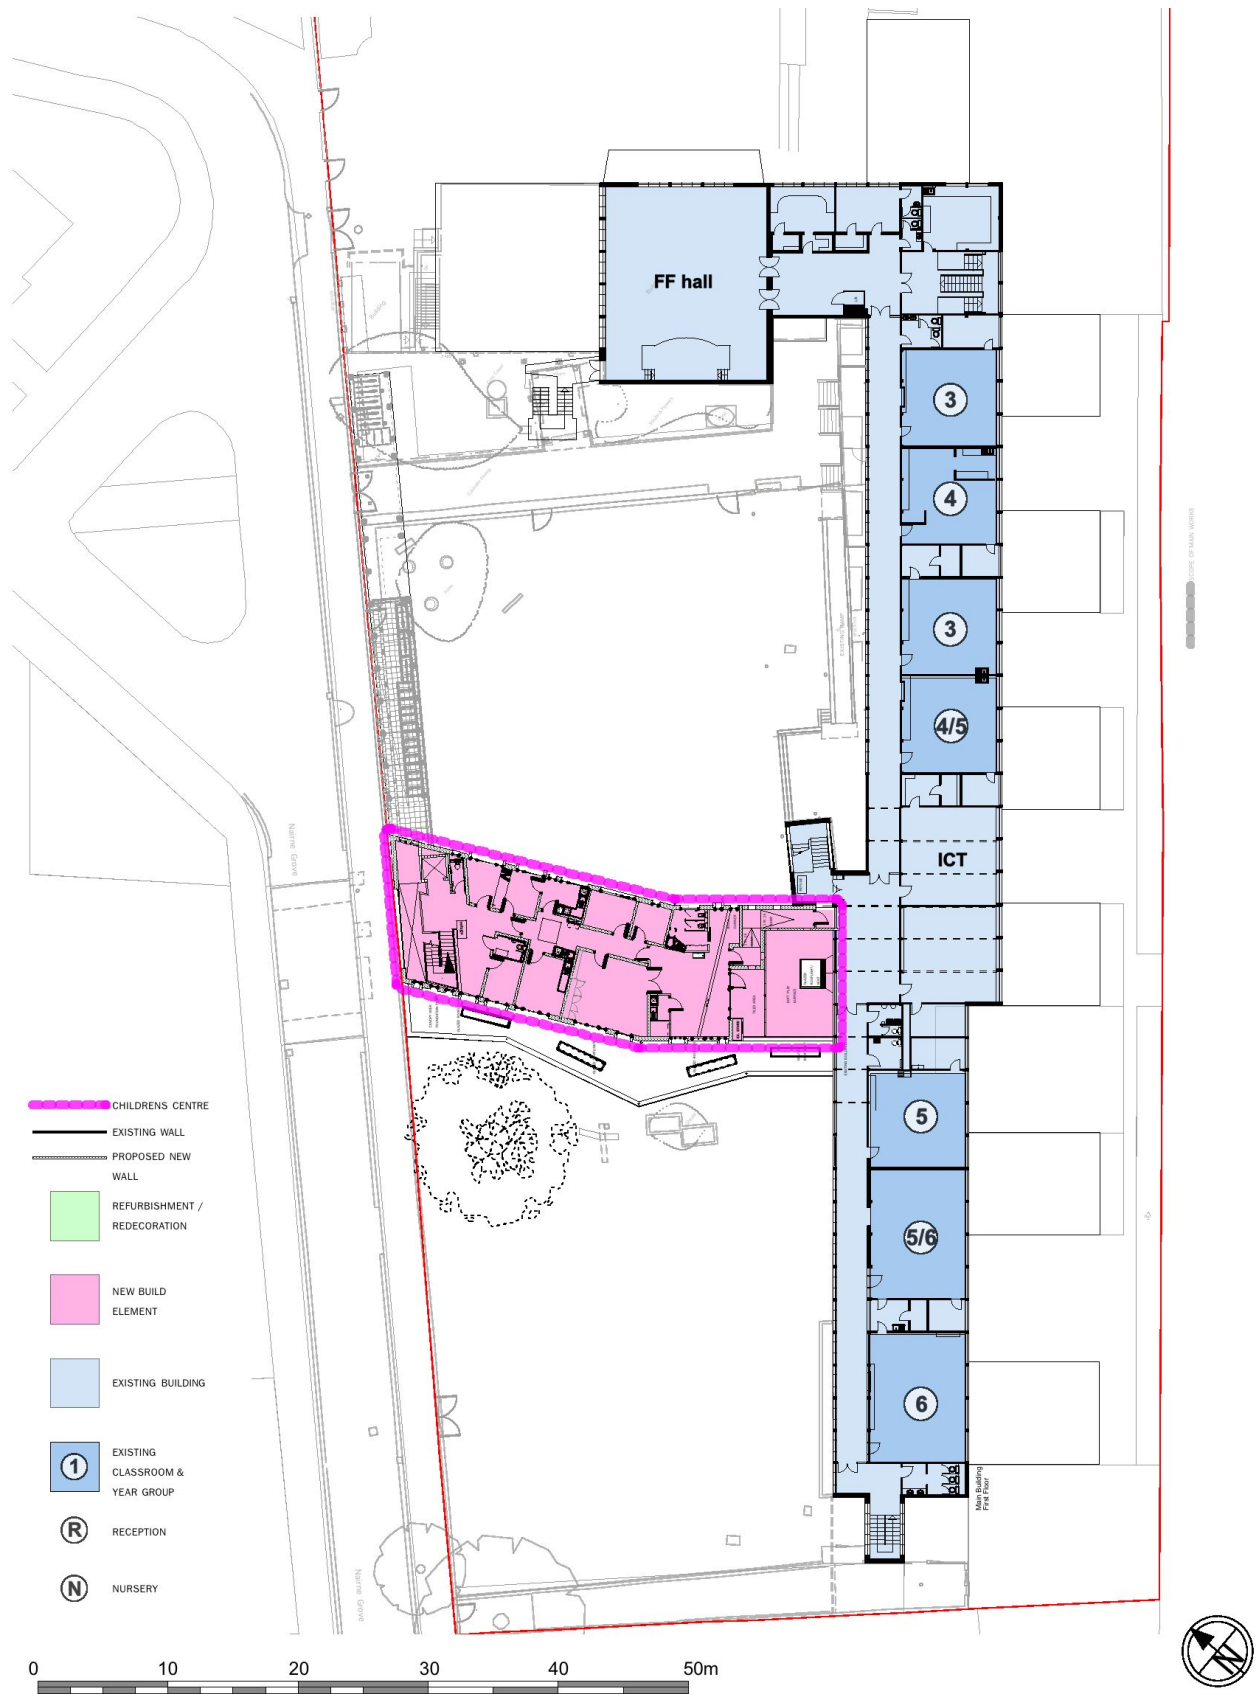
First Floor Plan of the 'Bessemer Grange' site - showing the New Building in pink
